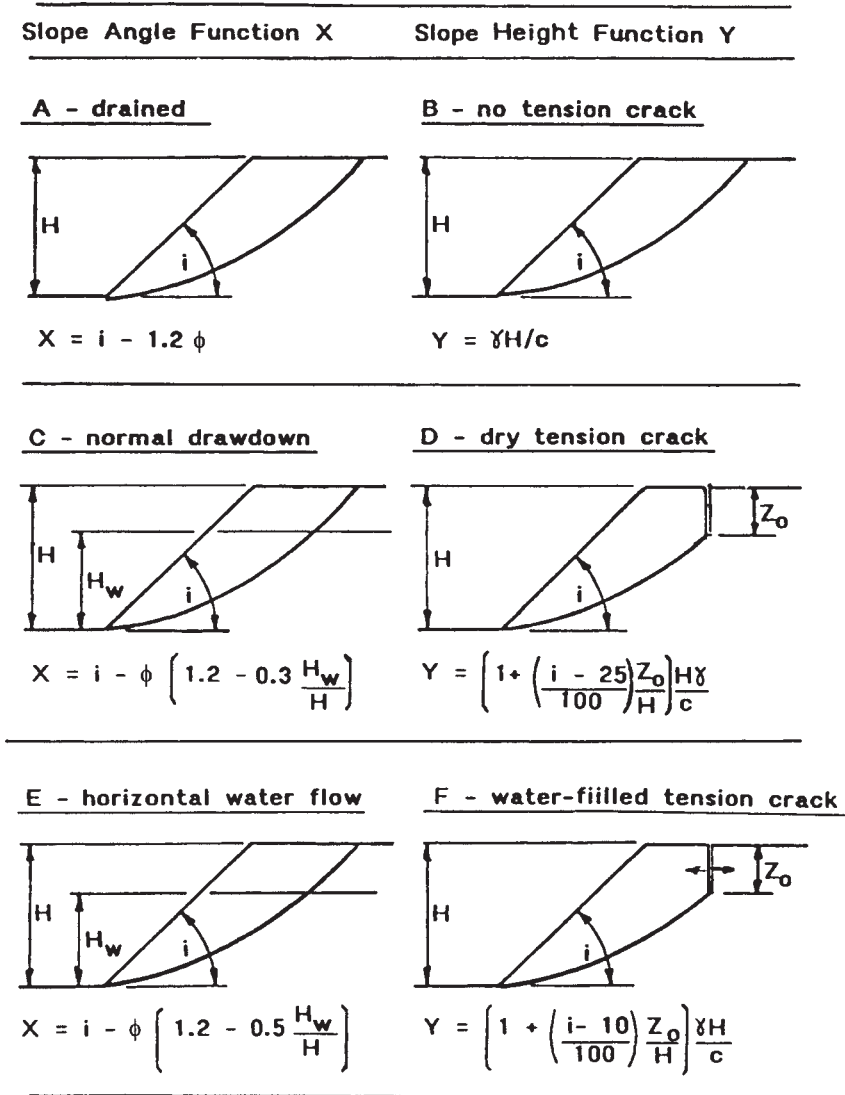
Slope angle and slope height functions for different water and tension crack conditions (Hoek, 1970a).
